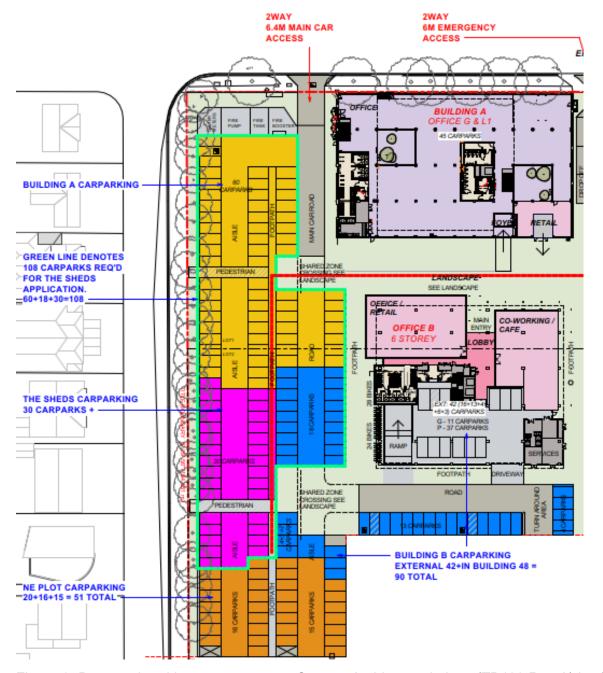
Proposed parking arrangements, Source: Architectural plans (TP400 Rev A) by *Six Degrees Pty Ltd
